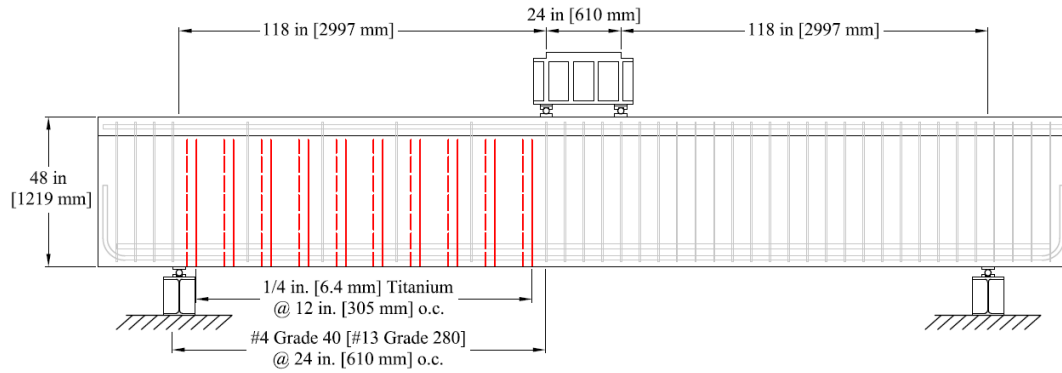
Elevation of specimen T5.24.12S.E1\
